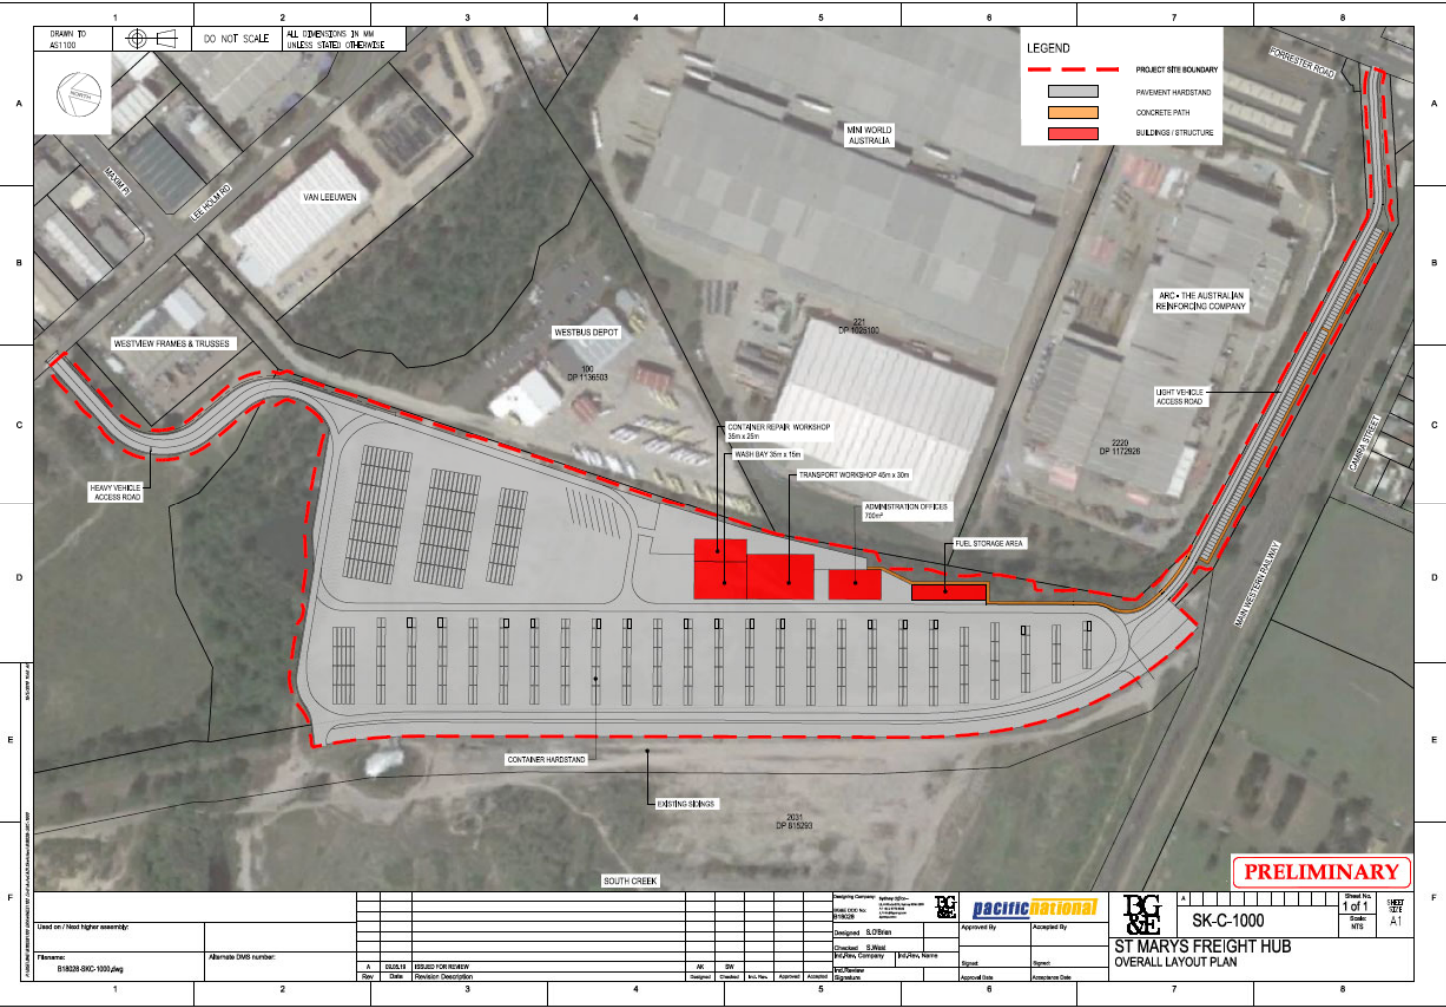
EXHIBITED – OVERALL LAYOUT PLAN
